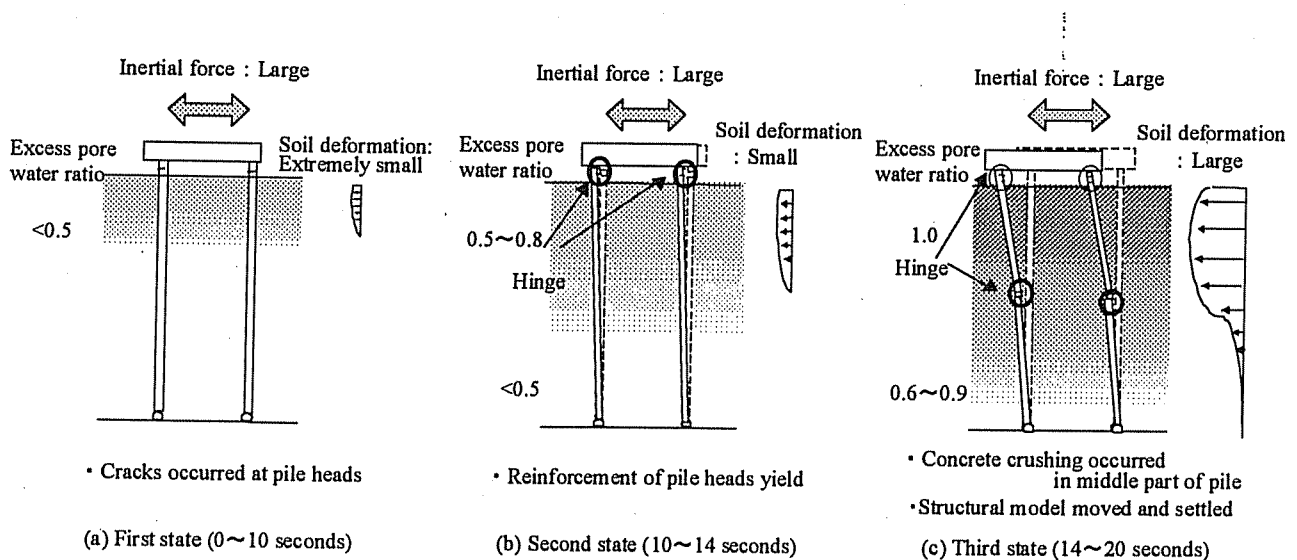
Schematic figures showing mechanism of pile foundation damages
